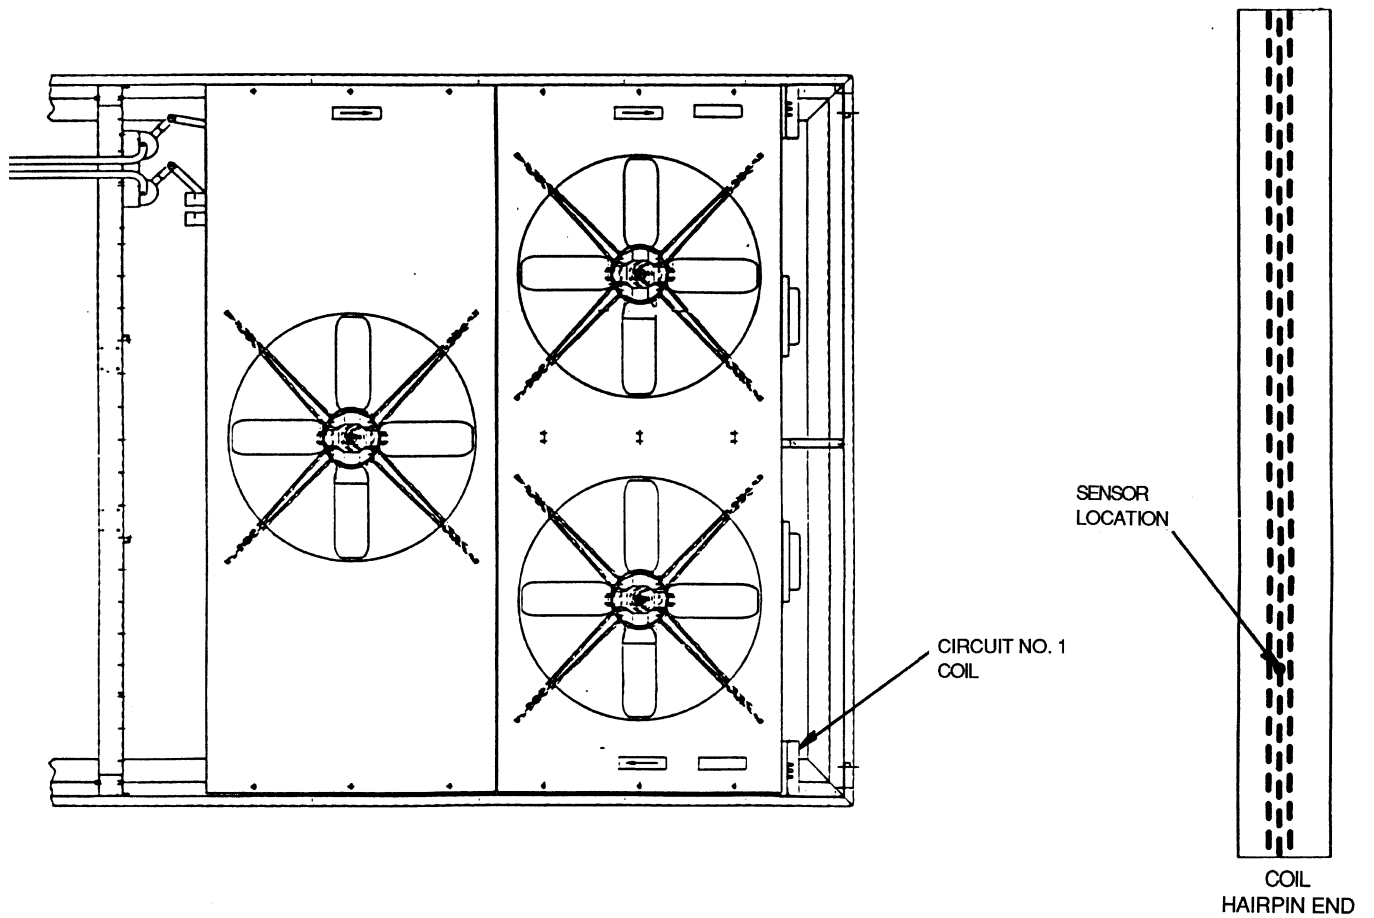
Motormaster® I Device Sensor Location, 48/50DJ,DK and 50DW,DY044 Units
